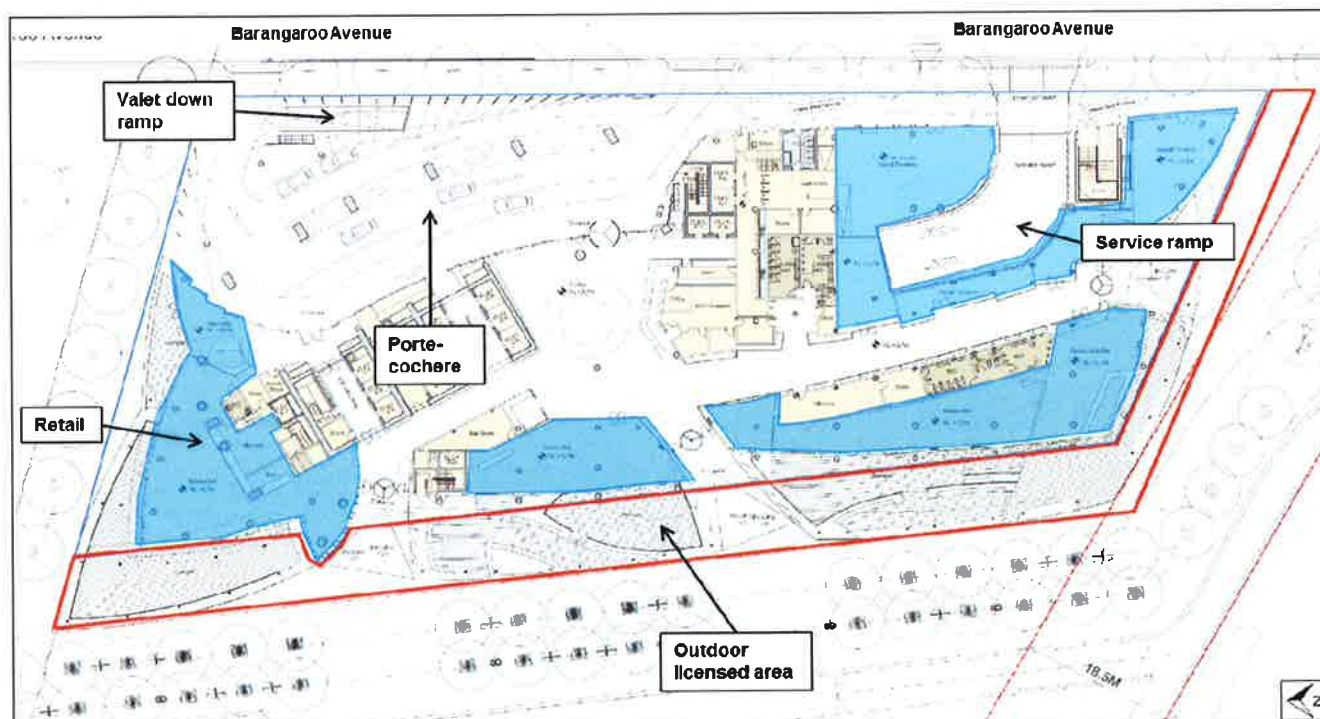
Proposed ground floor layout, including location of retail accommodation (highlighted blue) and outdoor licensed area (outlined in red) (Base source: Applicant's RtDAP)
